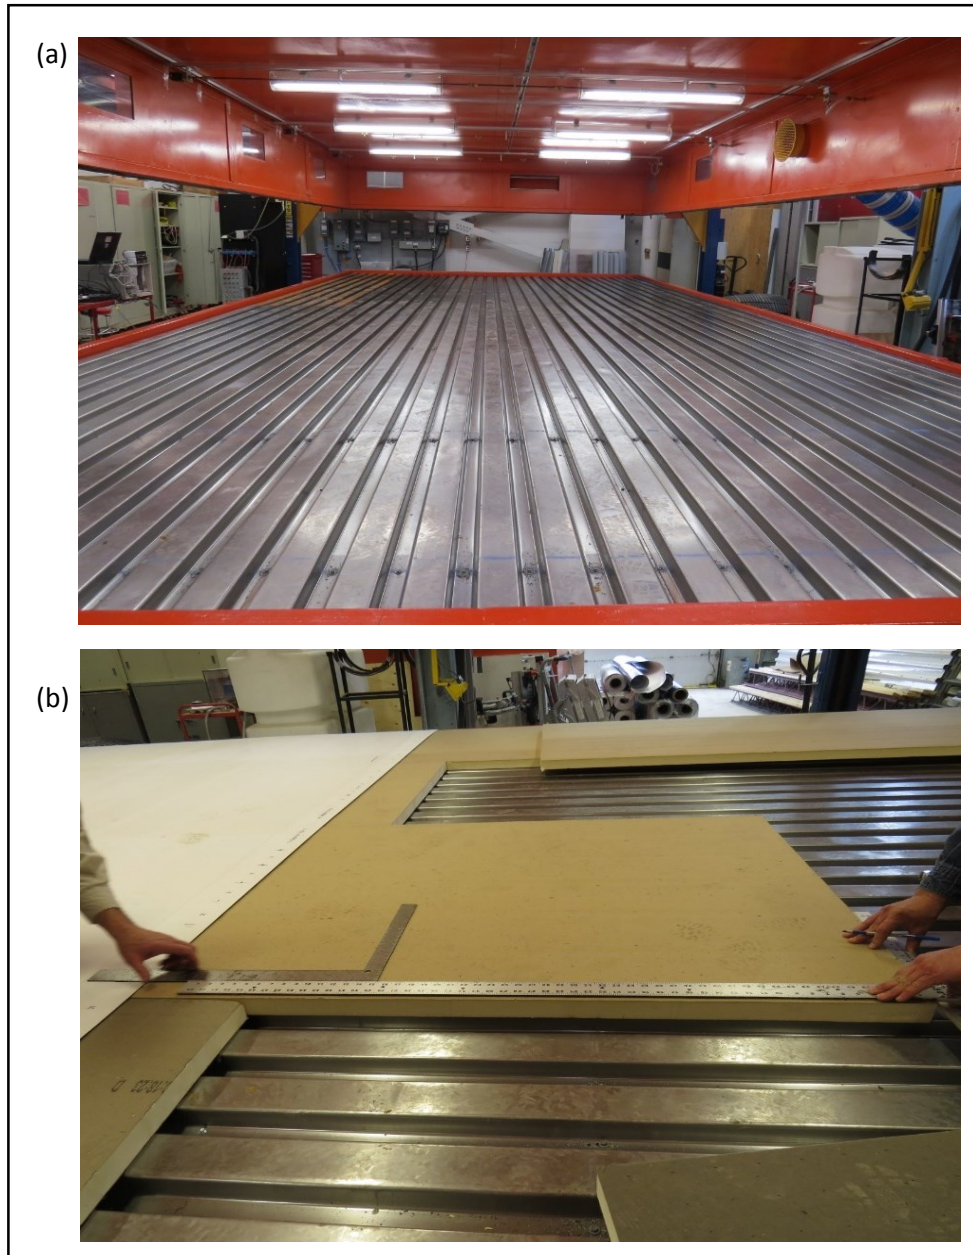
(a) Steel deck installation, (b) insulation layer setup
